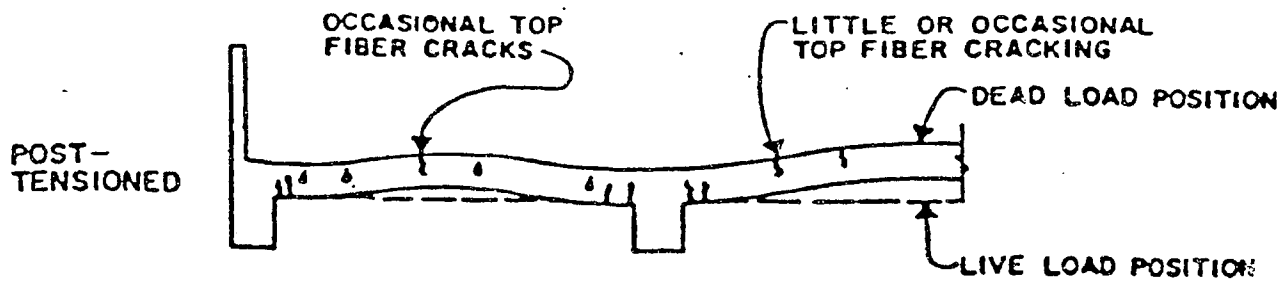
Schematic Continuous span slab construction under gravity loads
